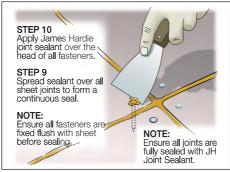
SEAL OVER FASTENERS AND JOINTS
